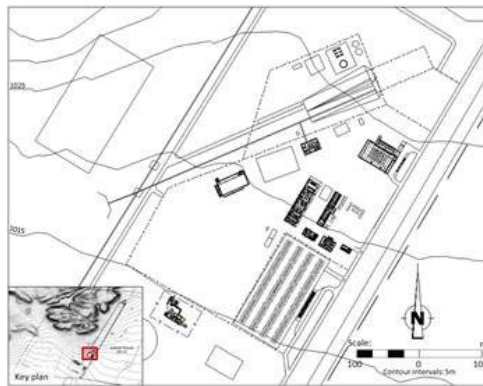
Surface Layout: North Complex (Source: Advisian)
